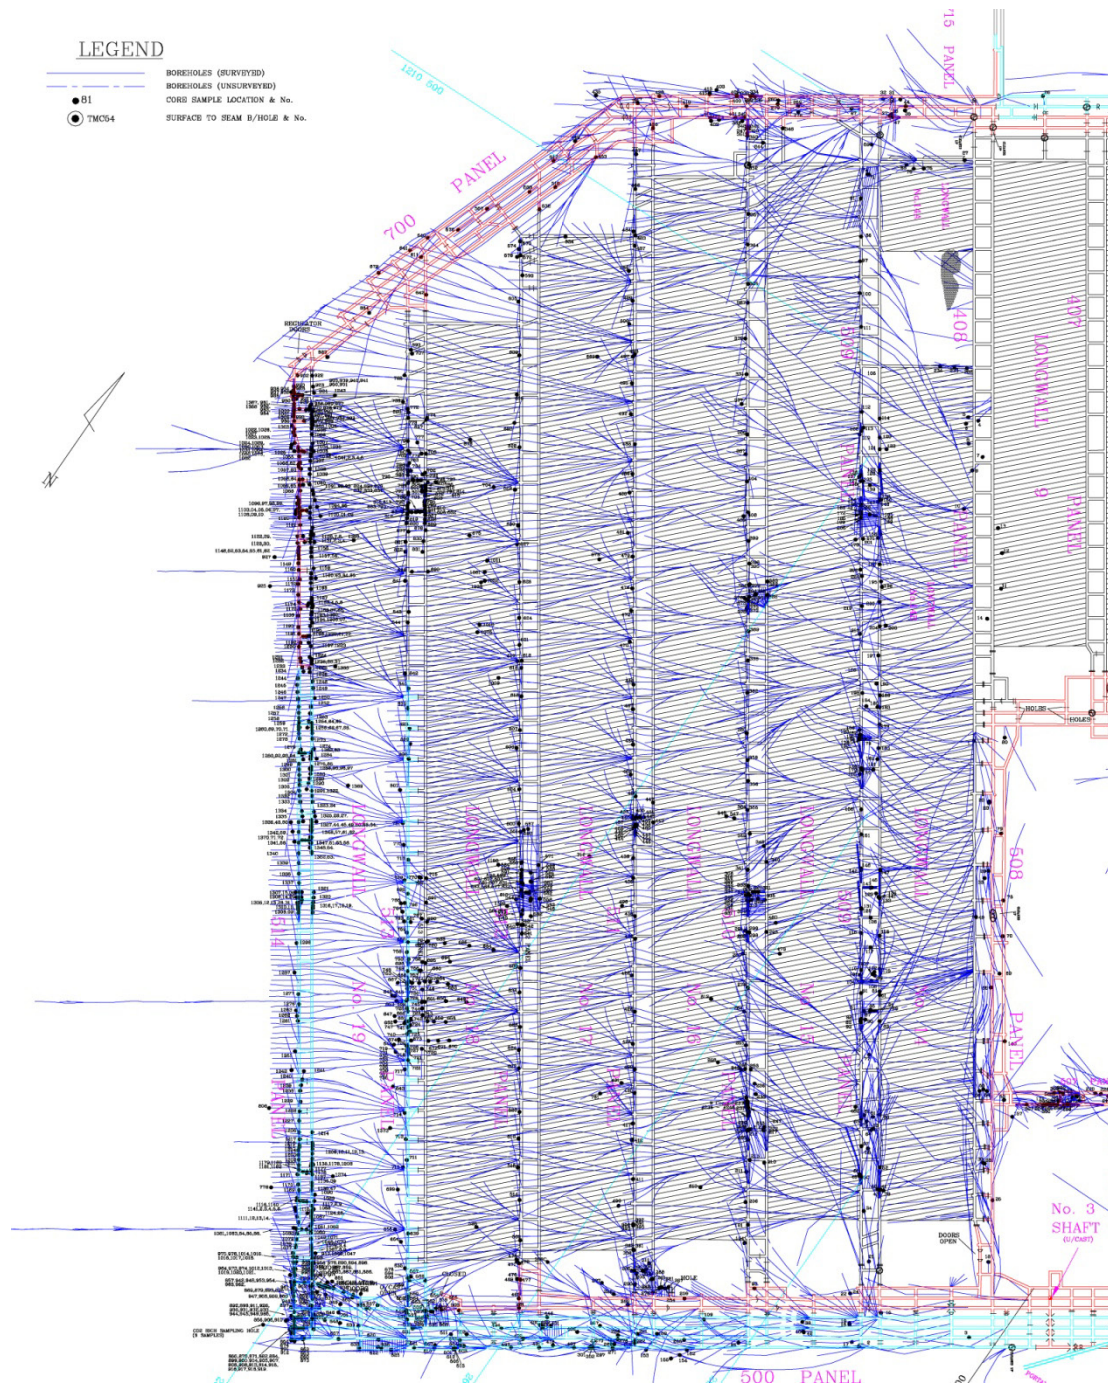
In-seam gas drainage Longwalls 14 to 19
